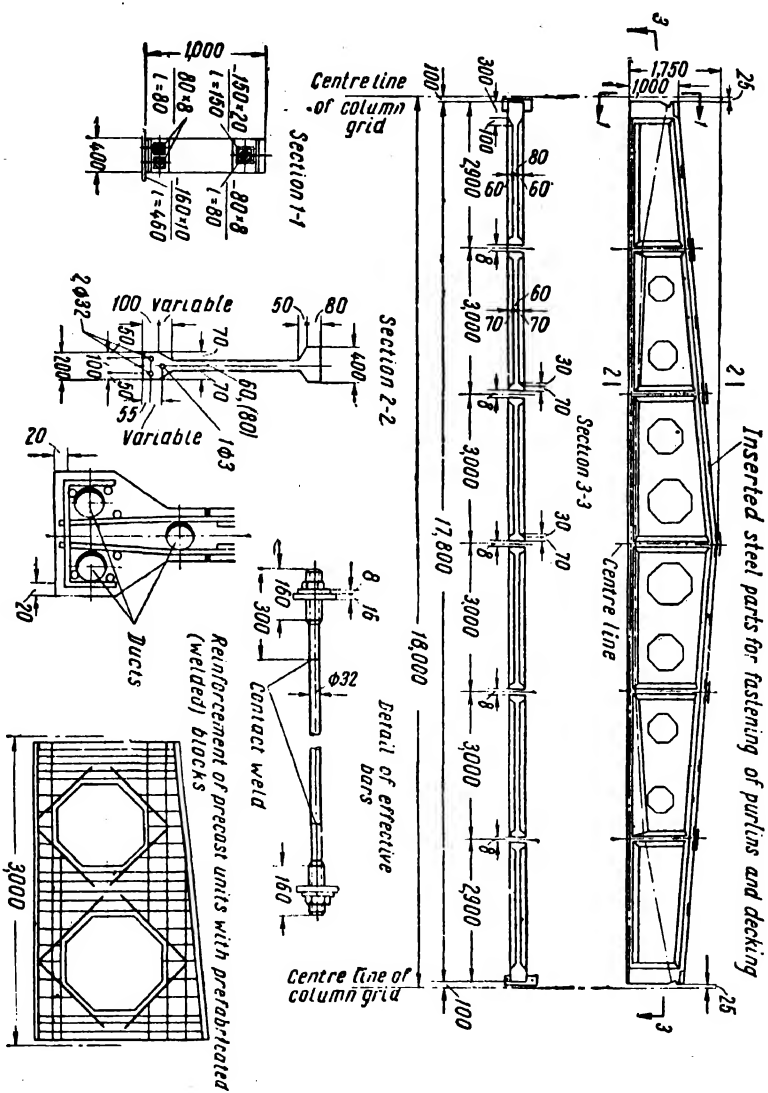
A girder made up of blocks tensioned against the hardened concrete
